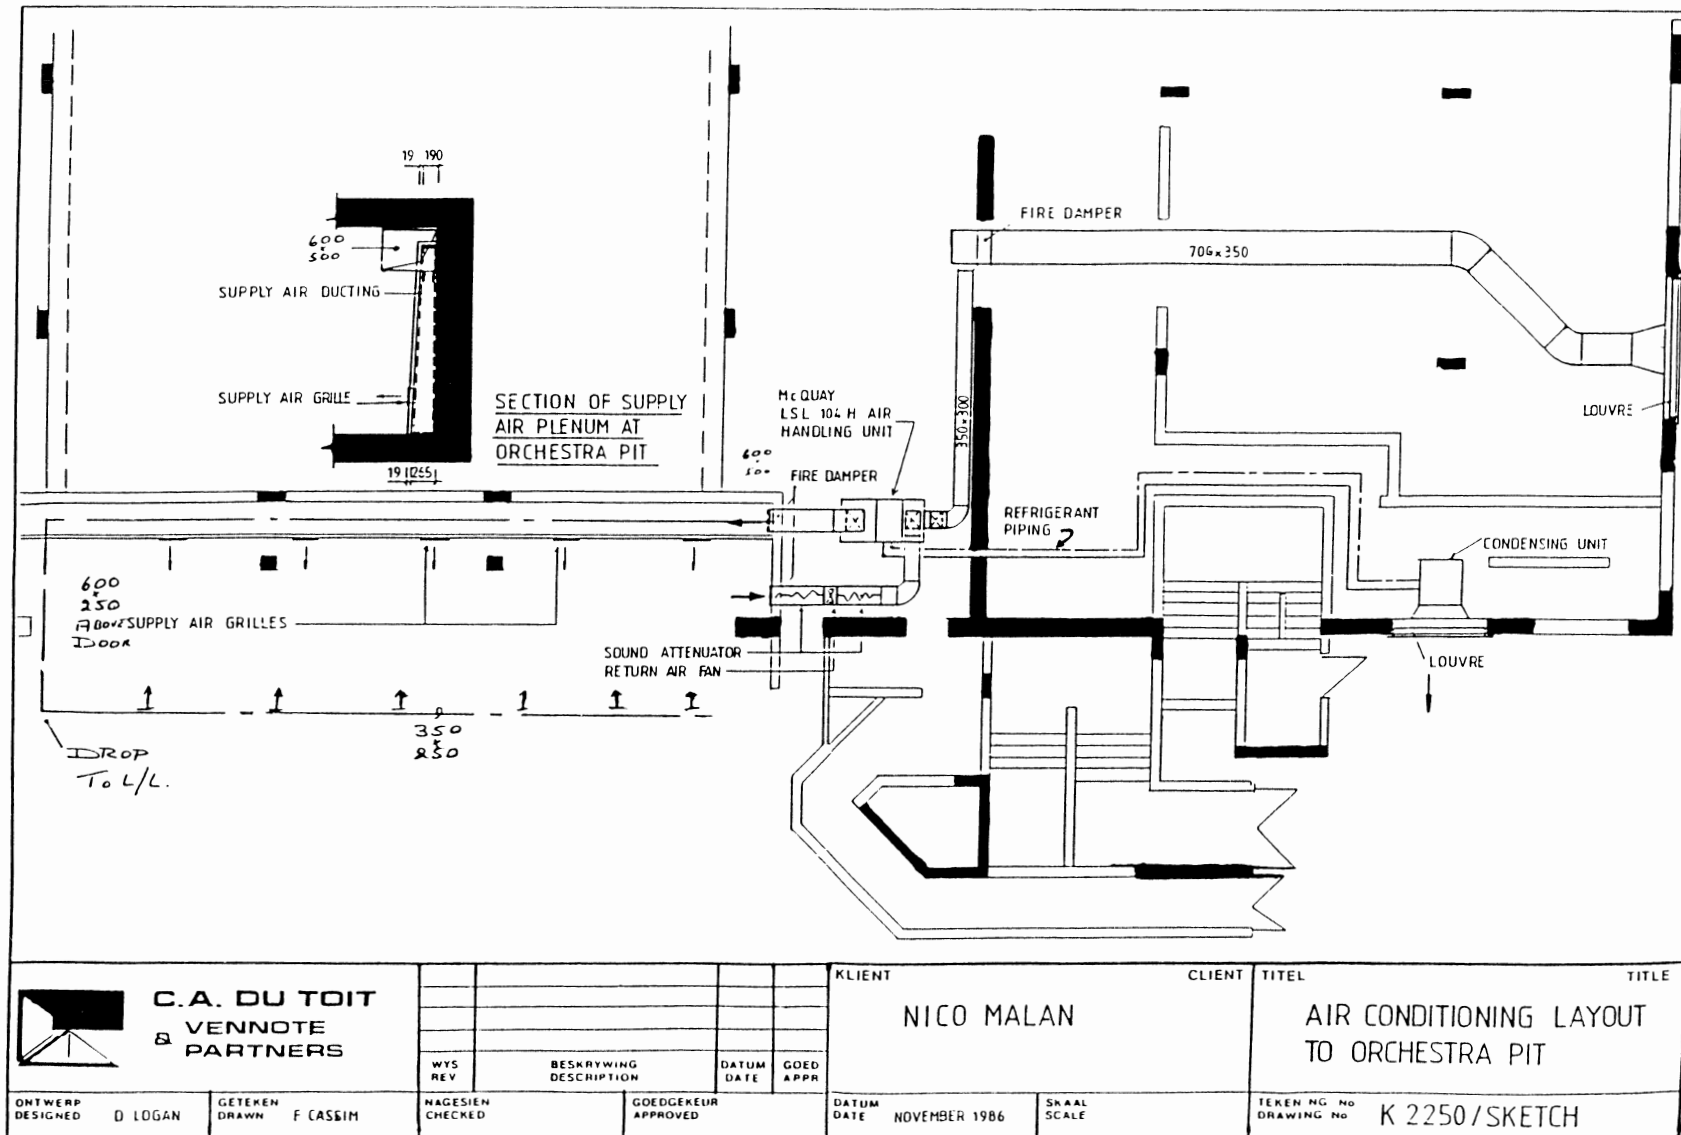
Plan for a separate air conditioning plant at the Nico orchestra pit (1986)
